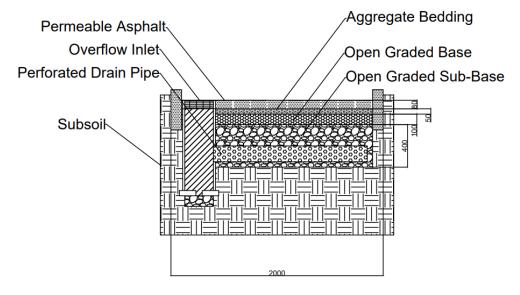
Cross Section of Permeable Pavement Cyclist Lane
